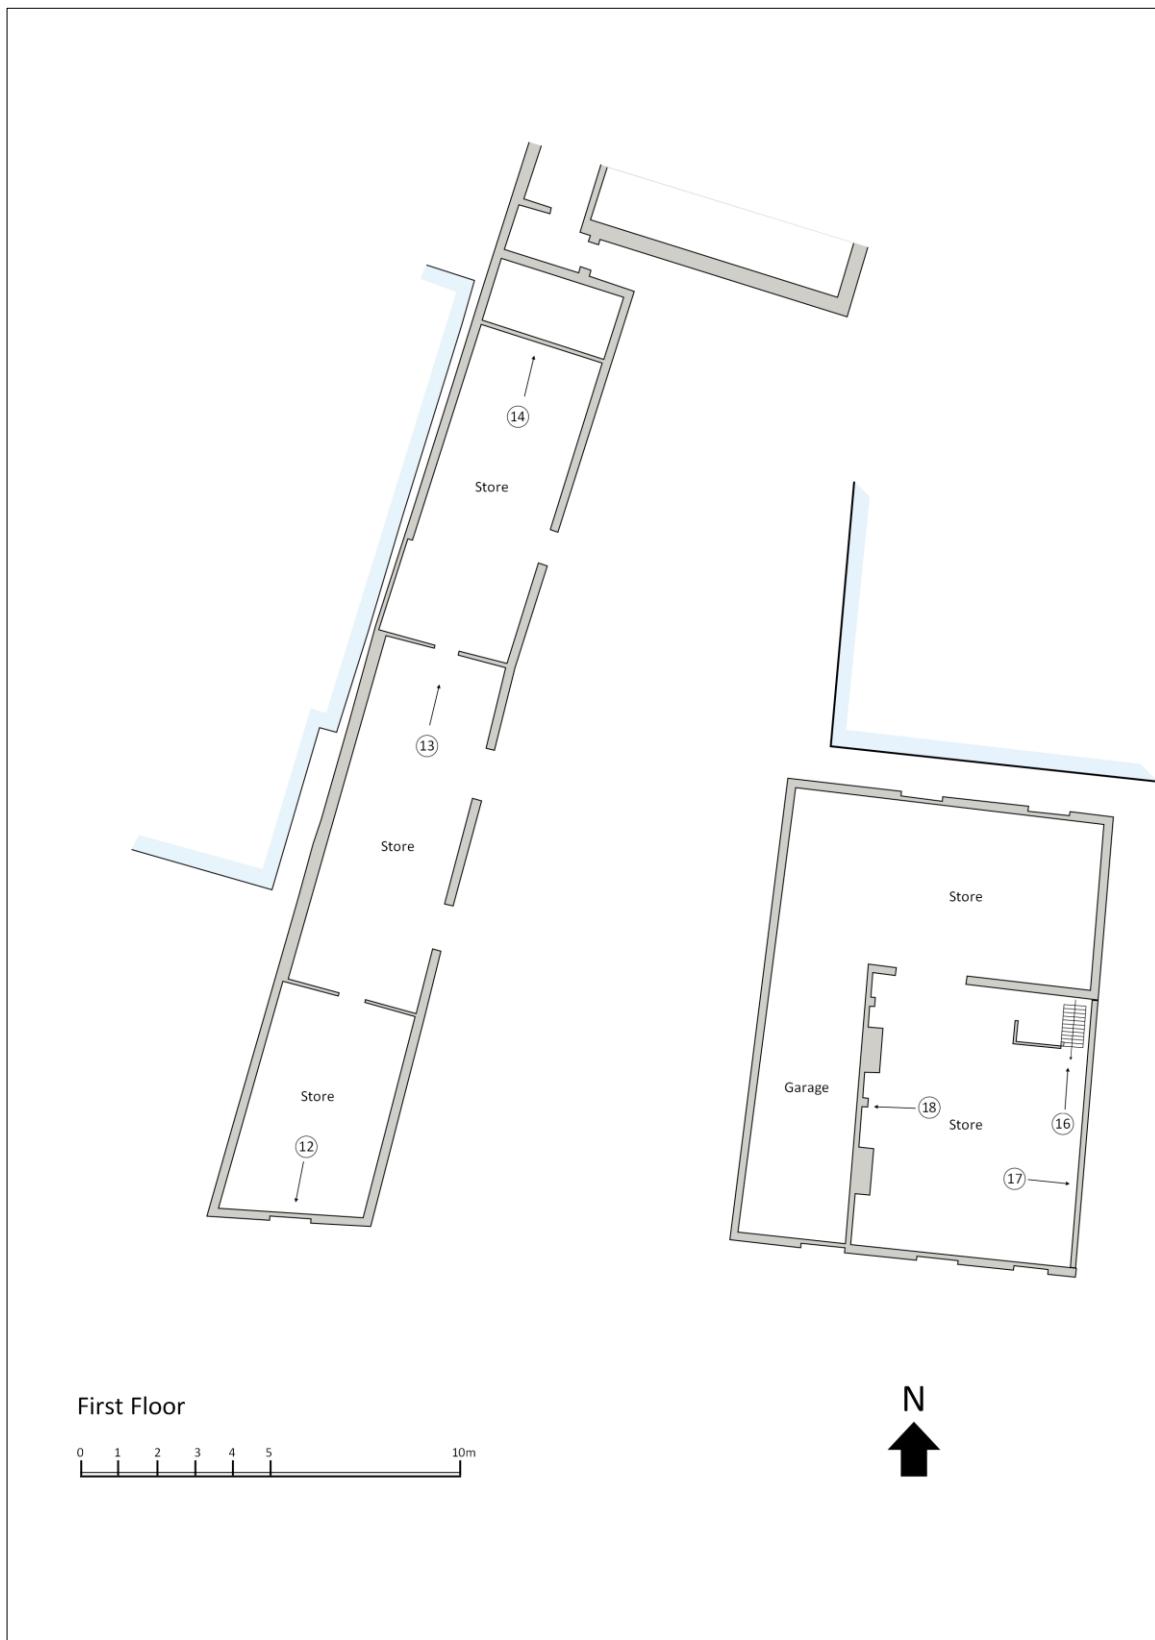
First-floor plan of outbuildings to the rear of No. 13 High Street Budleigh Salterton
